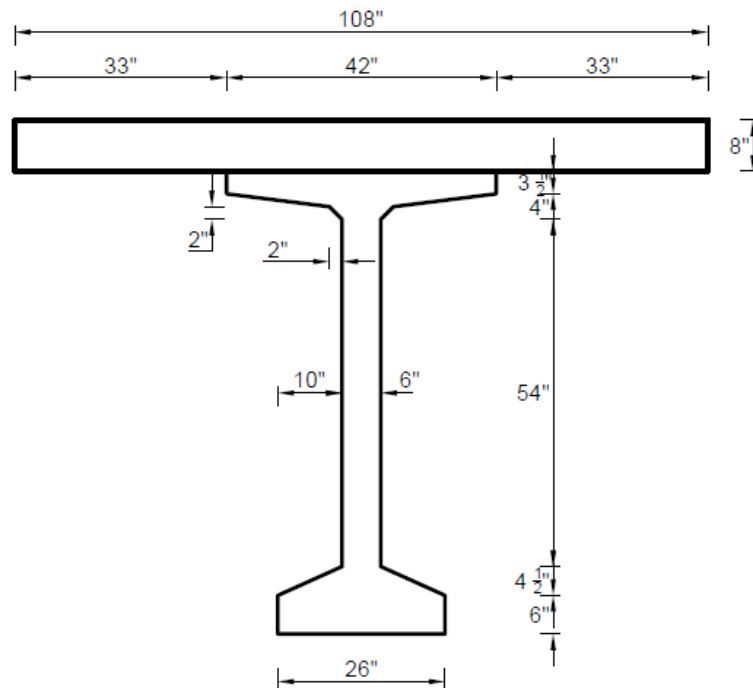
Composite (Girder + Deck) Section for Example Bridge
